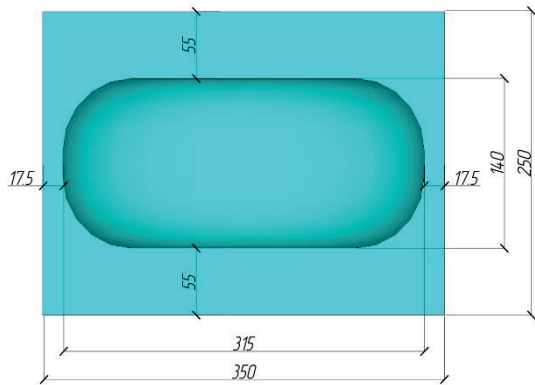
The cross-section of a void former cell used in the considered bubbledeck floor slab. Properties of the considered bubbledeck floor slab material are given in Table 1.
